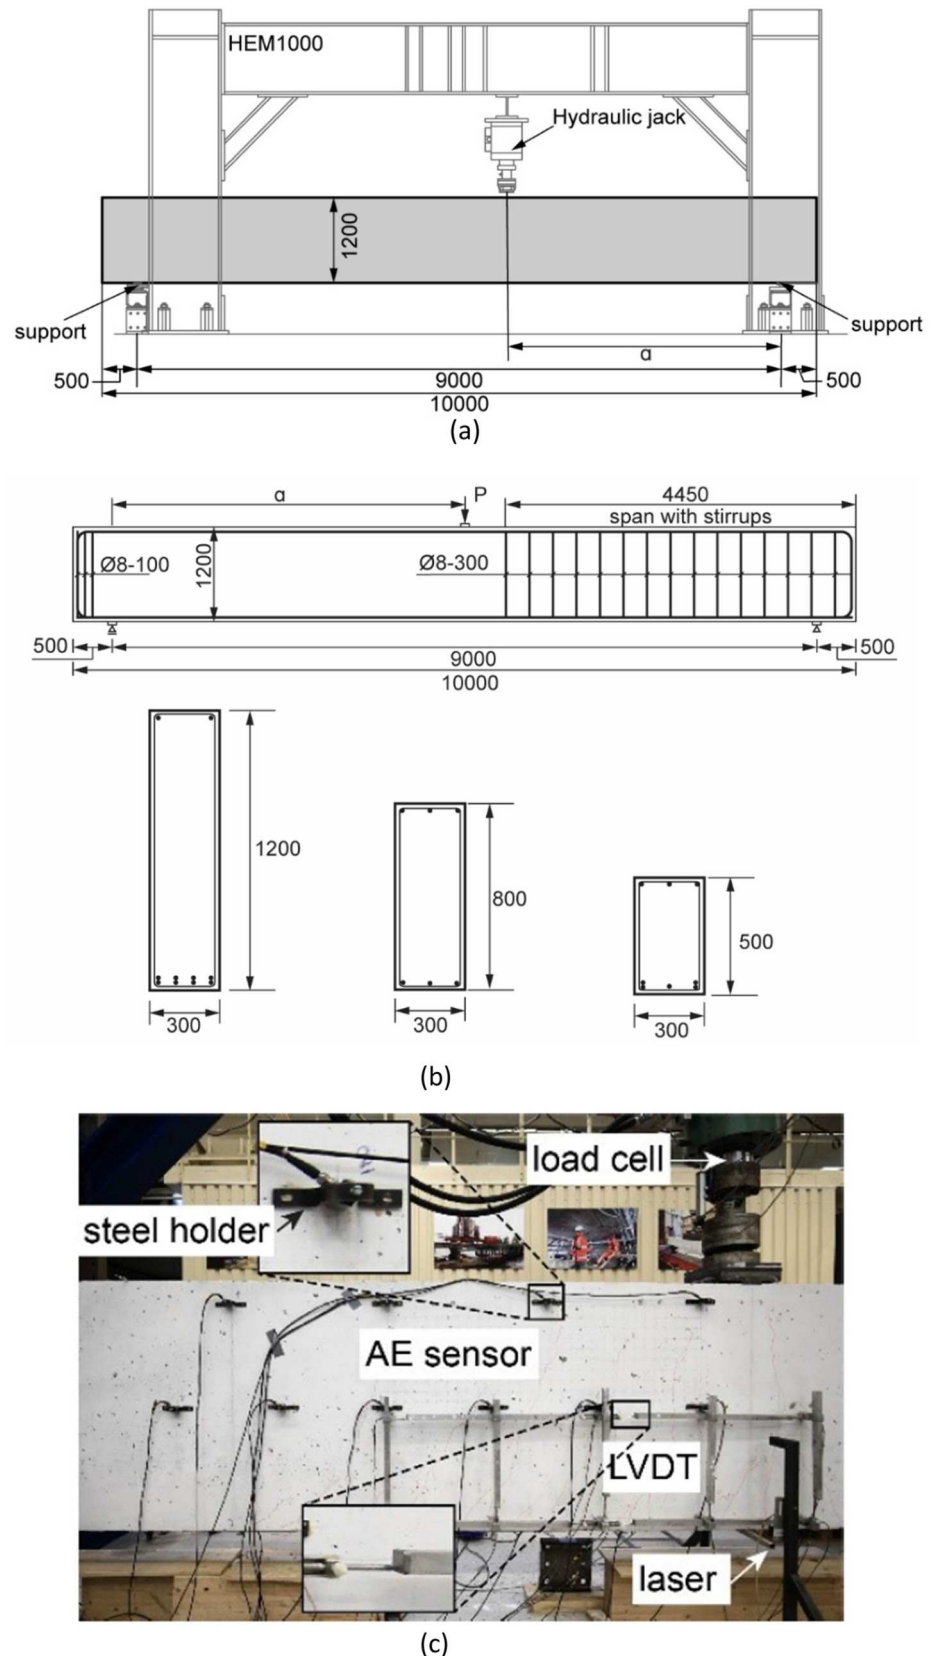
Details of slab strip experiments: (a) Test setup used for slab strips³¹; (b) reinforcement layout of the slab strips. Units in [mm]²⁷; (c) instrumentation as illustrated on H601A³²
